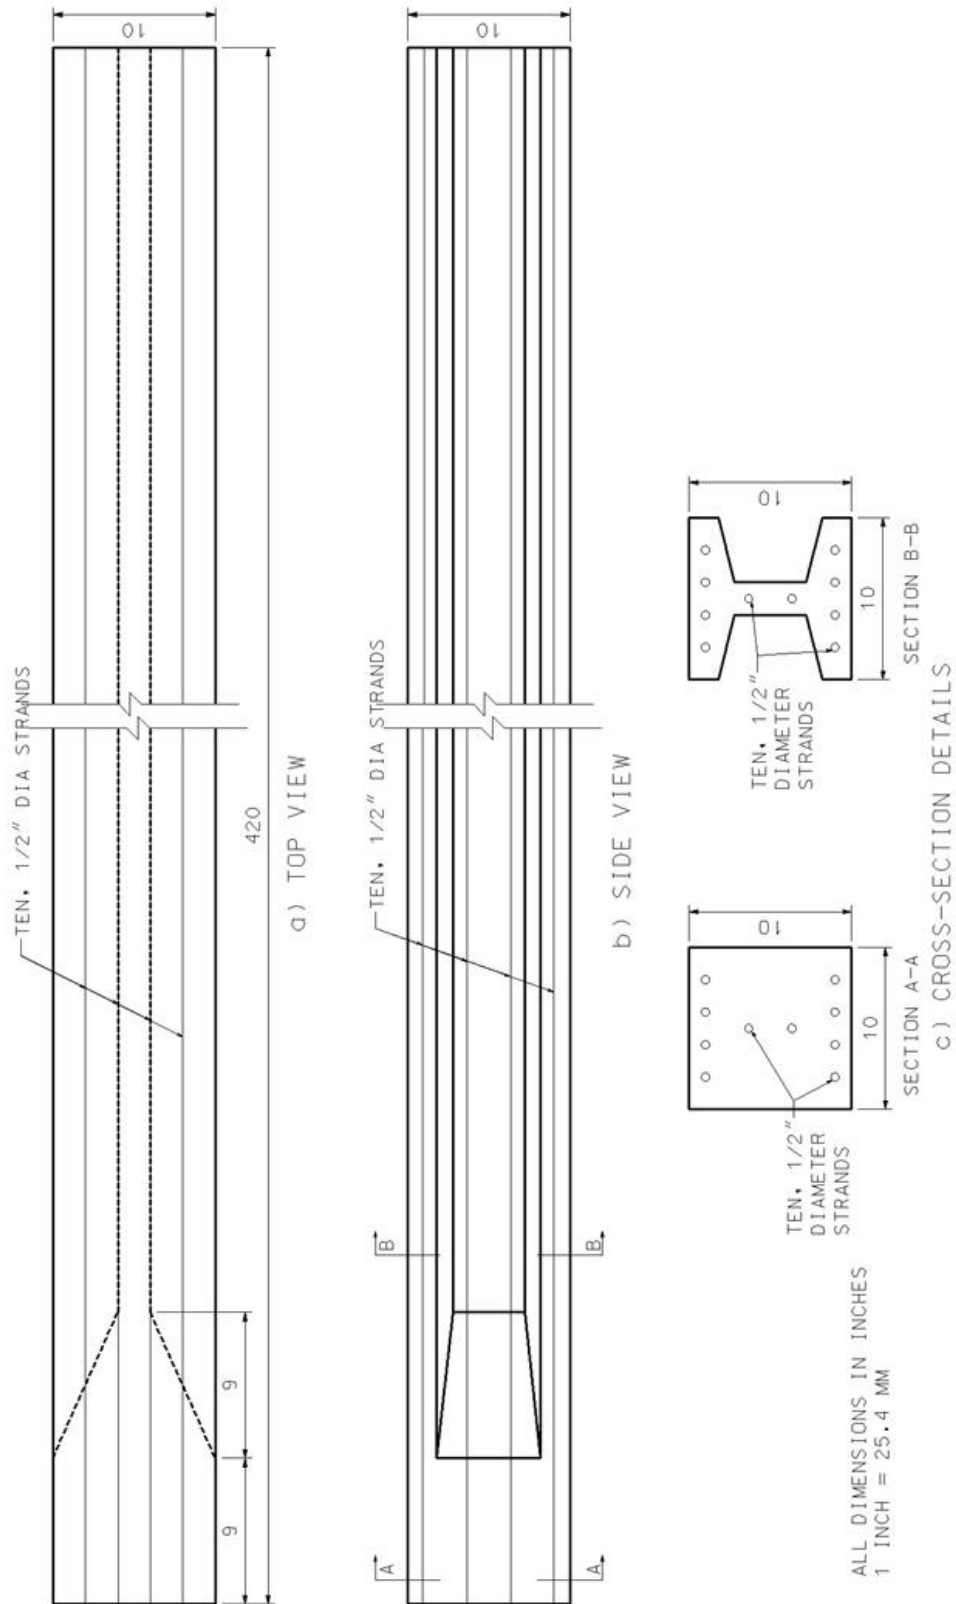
Dimensions and reinforcement details of the 35-ft (10.7-m) long UHPC piles for field tests
